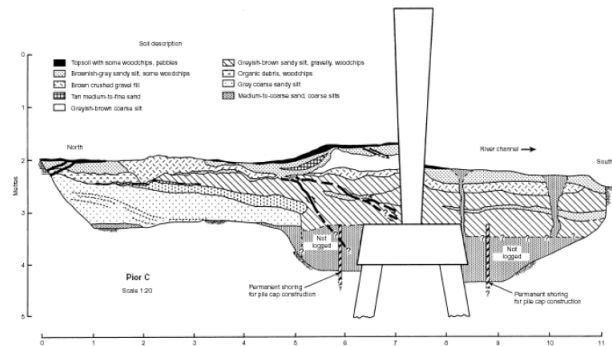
Pier C, trench log. (after Berrill et al. [8])
